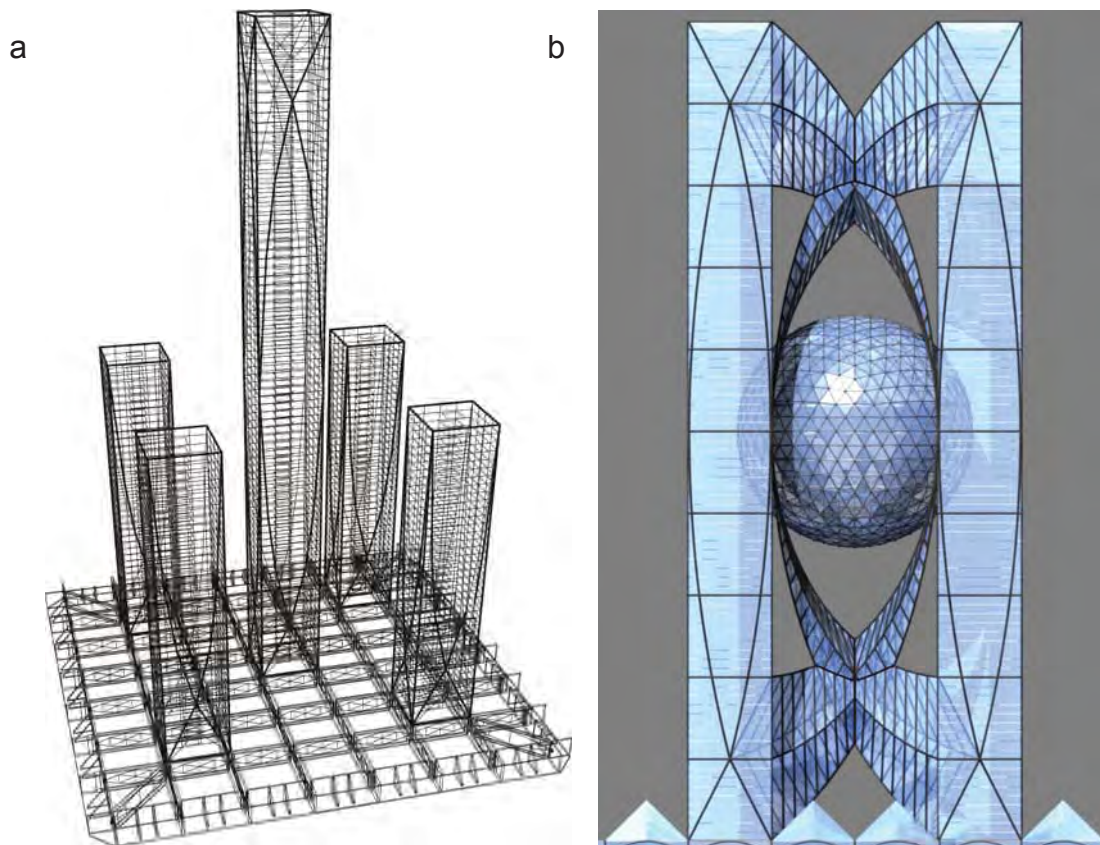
a) Example of form of a mega-structure based on system of the combined foundation, b) typical elevation of the complex GeoDome Sky Towers
